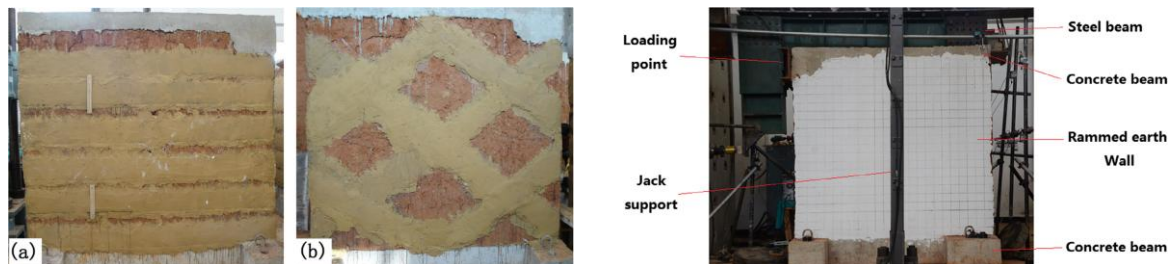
Reinforced specimens and test set-up (Lui 2015)
